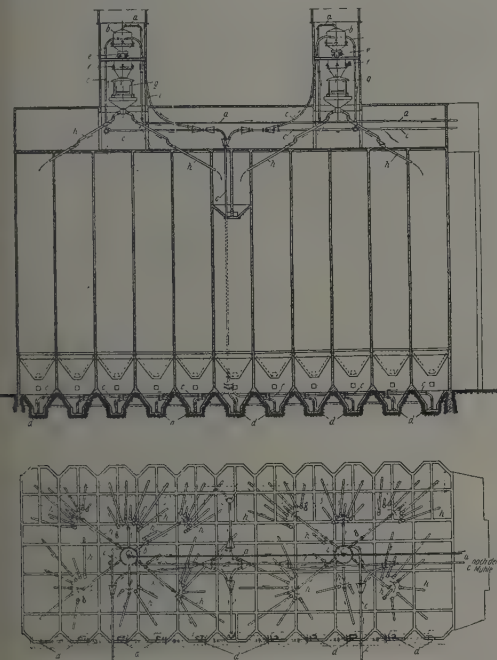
SECTION AND PLAN OF THE GRAIN ELEVATOR
